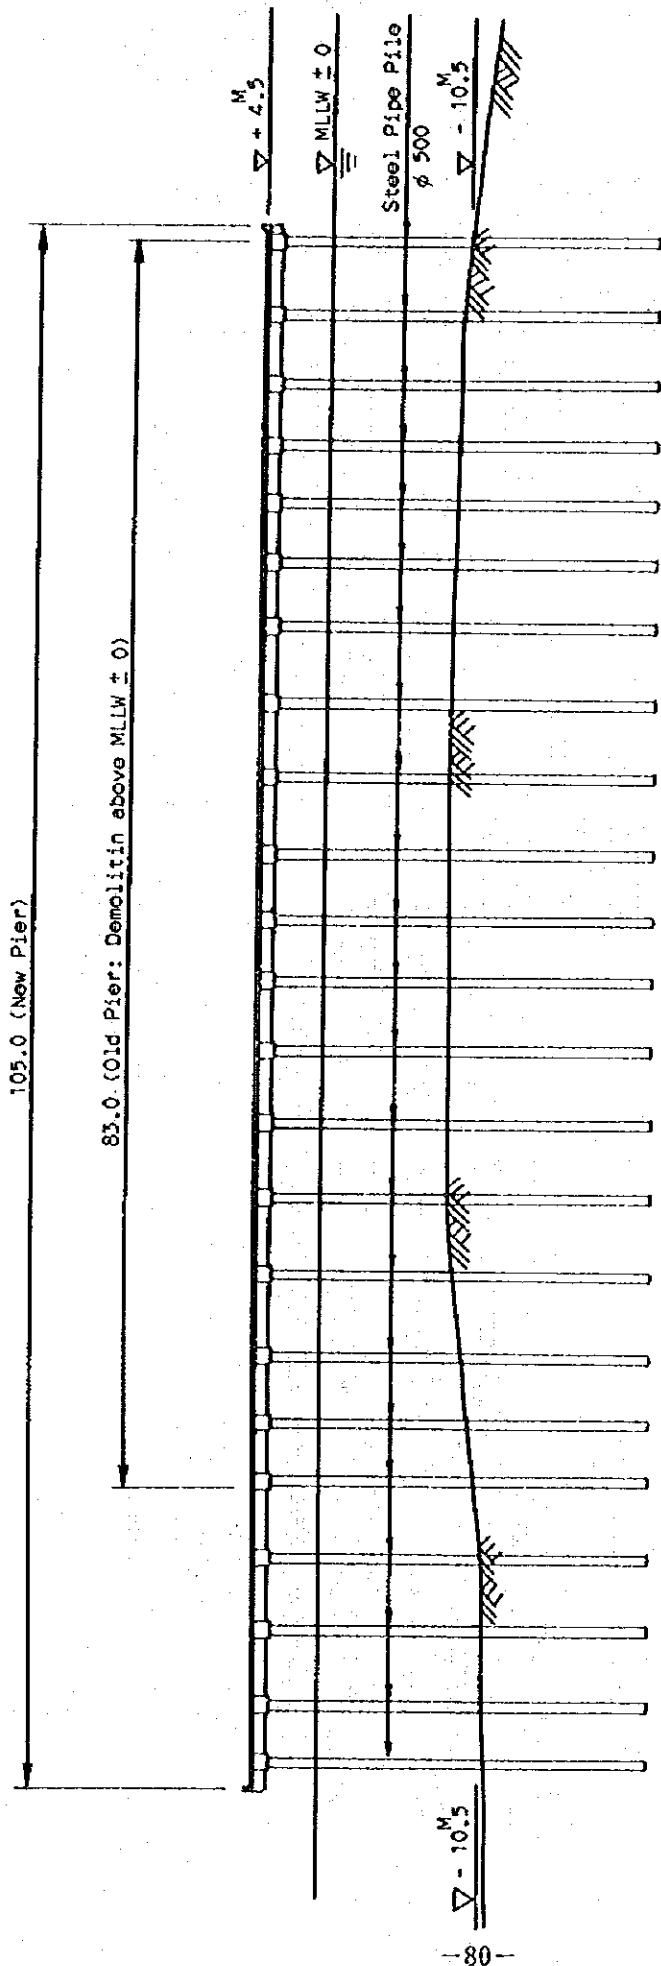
Proposed Section for Pier 13 (Alternative 4)
